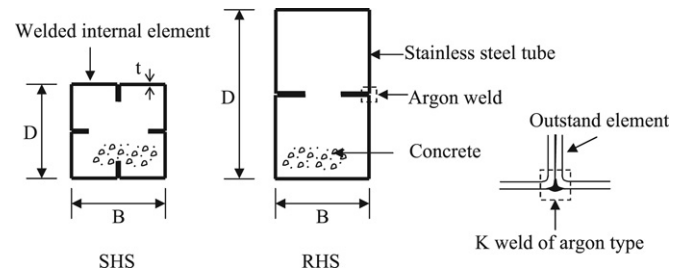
Definition of symbols for concrete-filled stainless steel stiffened tubular stub columns.
